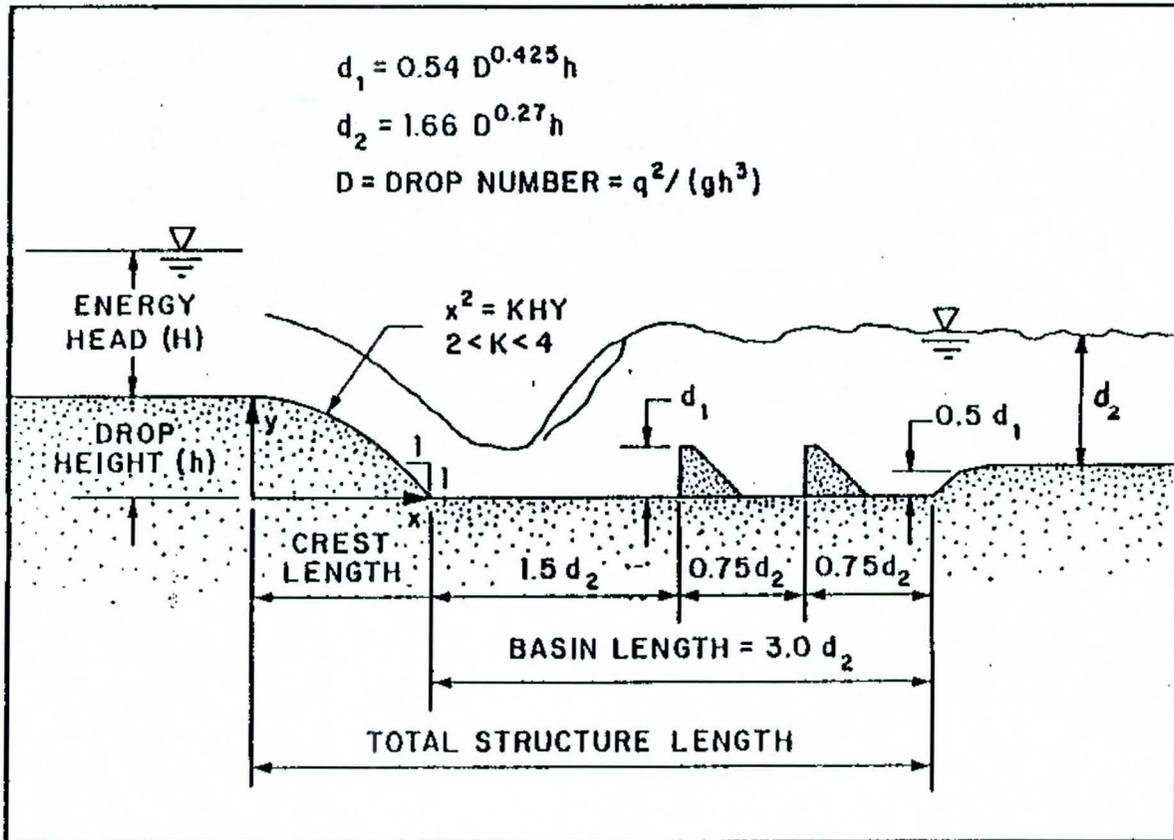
Design layout of drop structure (after Turner and Mulvibill 1987).
